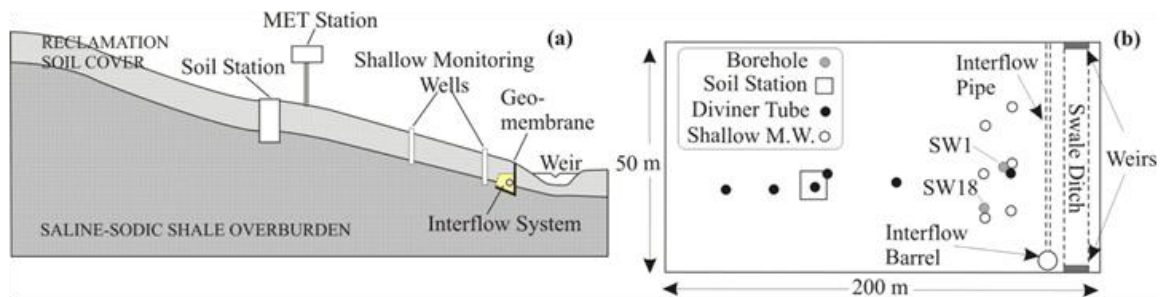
(a) Schematic cross-section of instrumented test section. (b) Plan view of cover.
